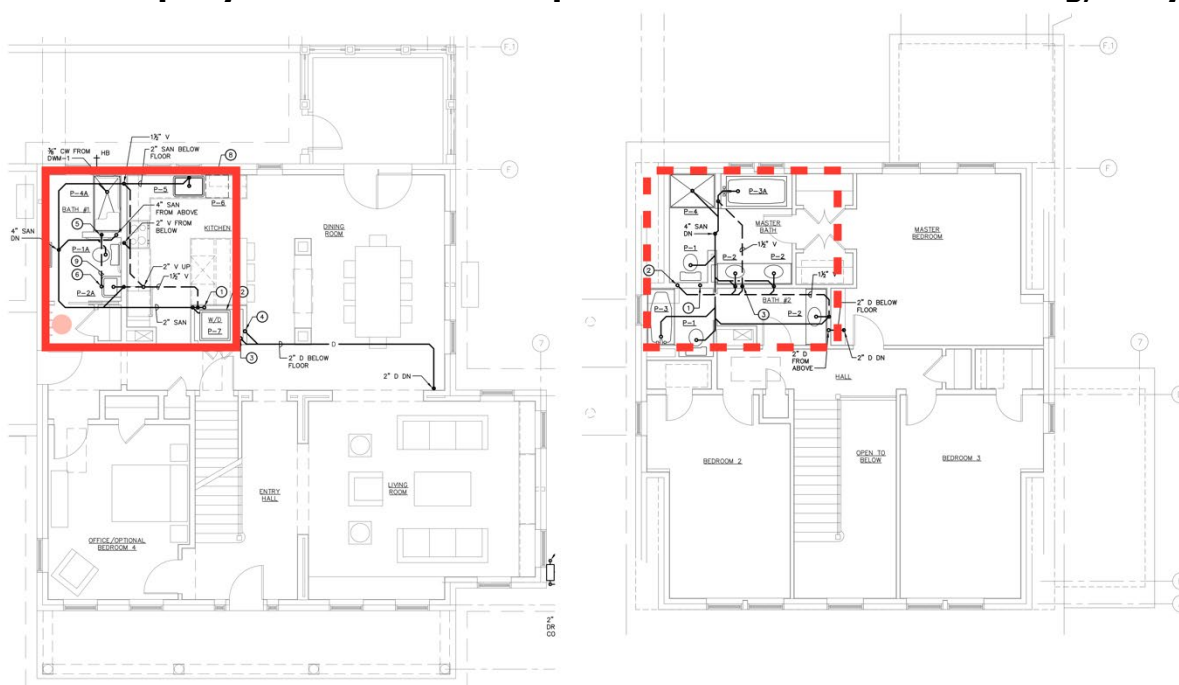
Exemplary Floor Plan: 1223 Square Foot House in Stockton, California
